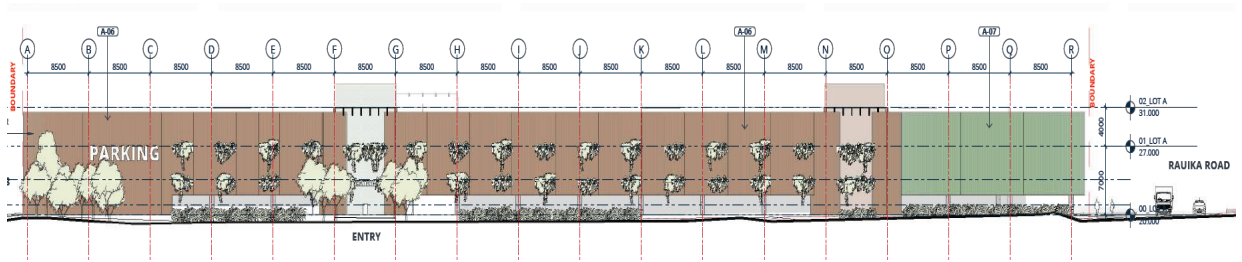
The western façade of Lot A as viewed from Te Ara Hingaia Road. (Source Ignite)
